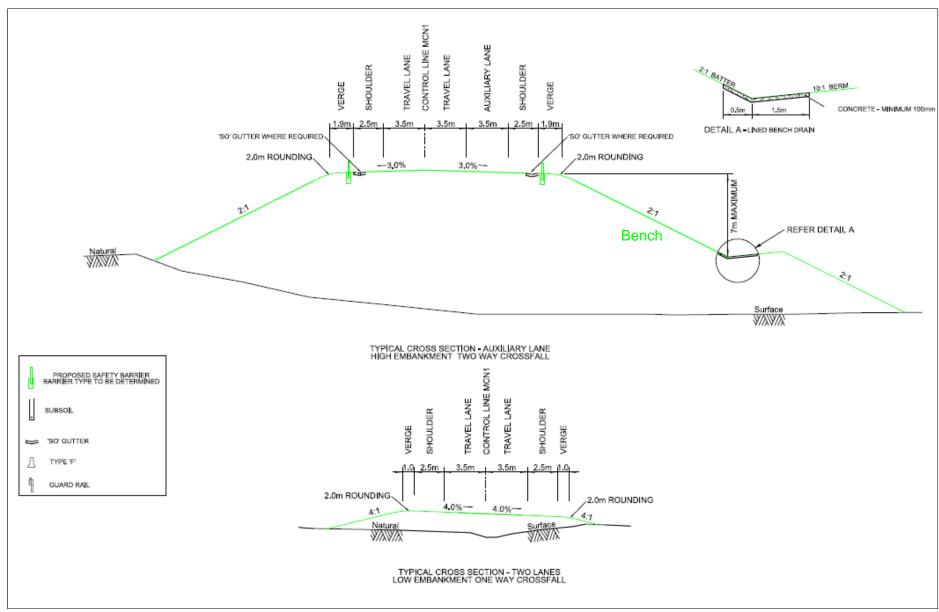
Typical cross section of proposed new Olympic Highway on embankment, including auxiliary lane
